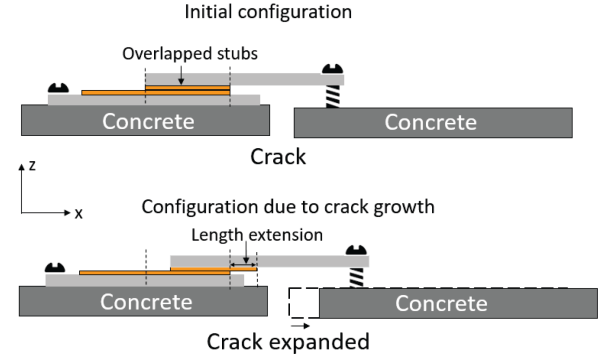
Configurations of the patch antenna loaded with a mechanically extendable stub for concrete crack monitoring (a) prior to the crack expansion and (b) after the crack expansion.
